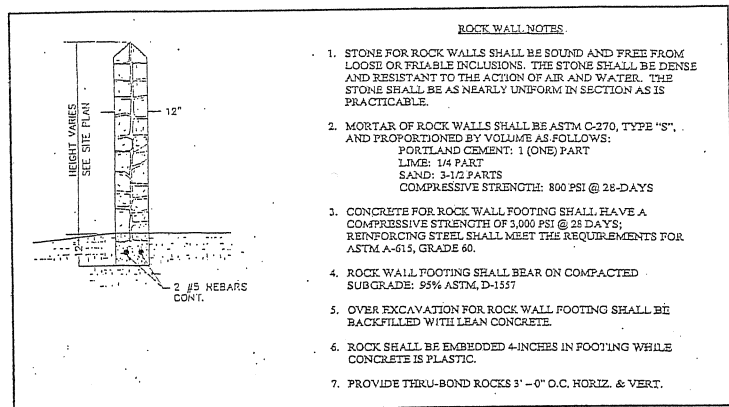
Construction Detail for Six Foot Rock Wall
